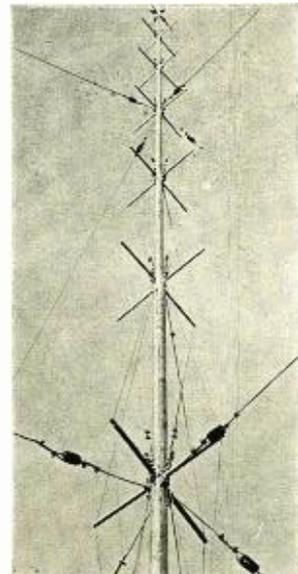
Showing the wire cable trusses used to stiffen the steel pipe mast.
